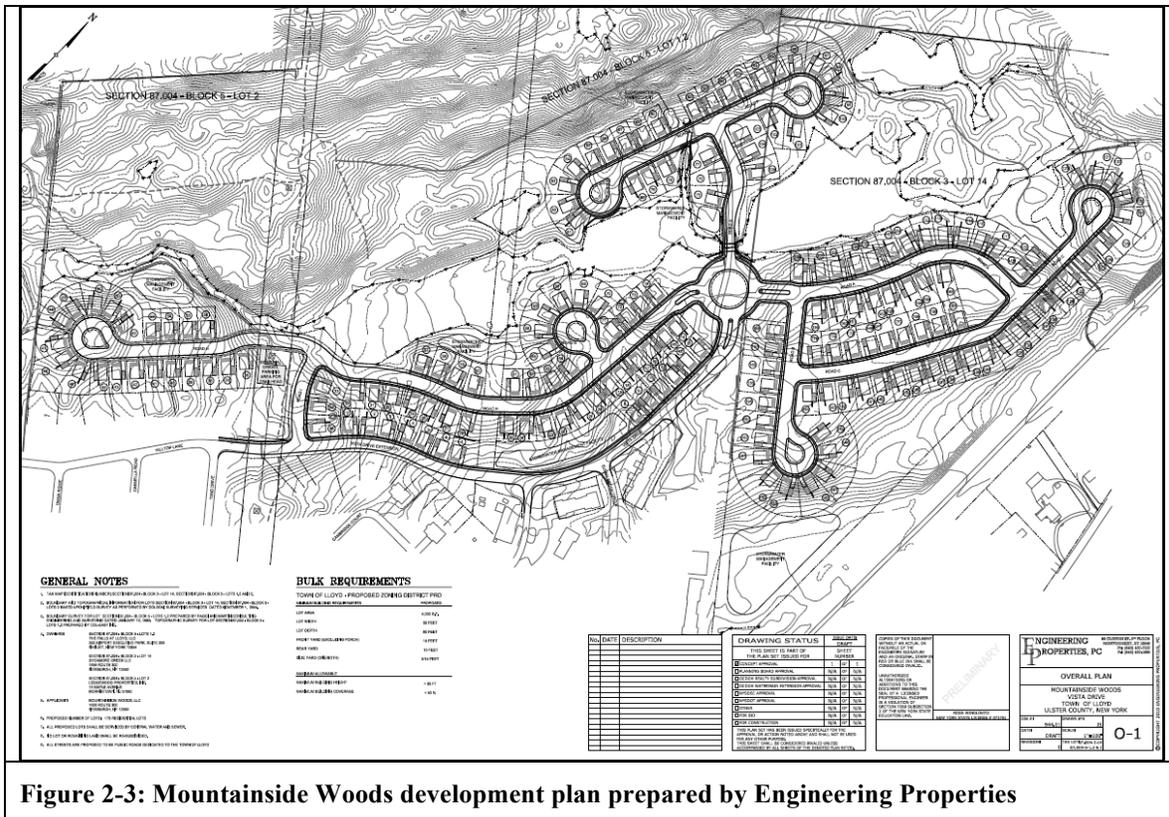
Mountainside Woods development plan prepared by Engineering Properties
